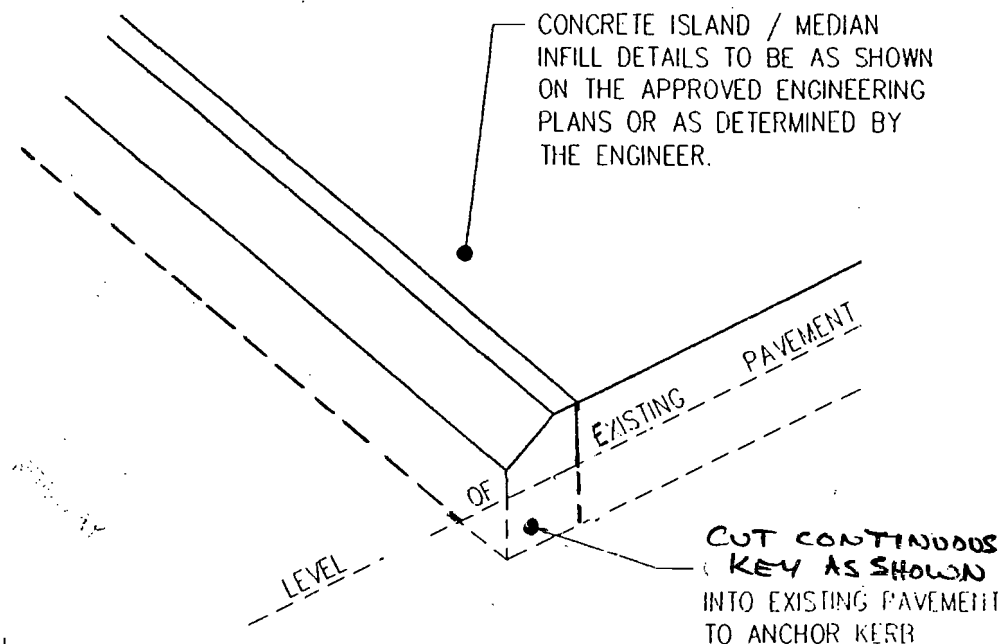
DETAIL OF DOWELLING MOUNTABLE (SF) KERB
